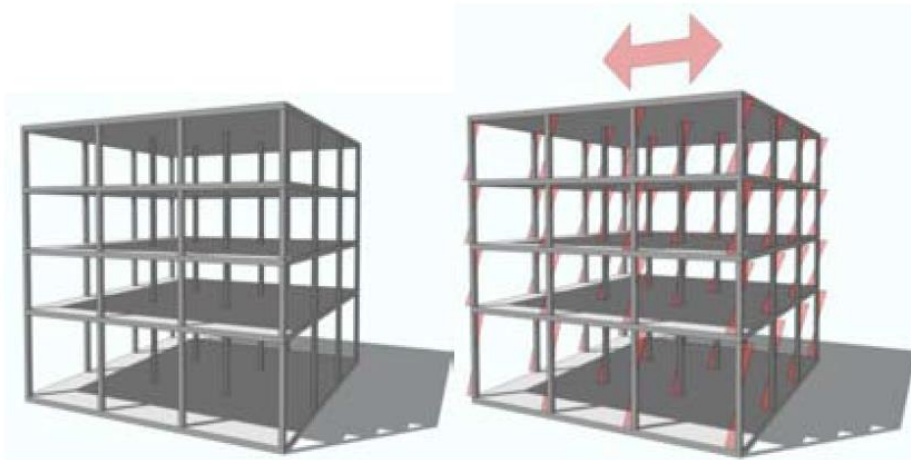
behavior of the building without the stiffening action of the masonry (Informe del Sismo de Lorca del 11 de Mayo de 2011)
